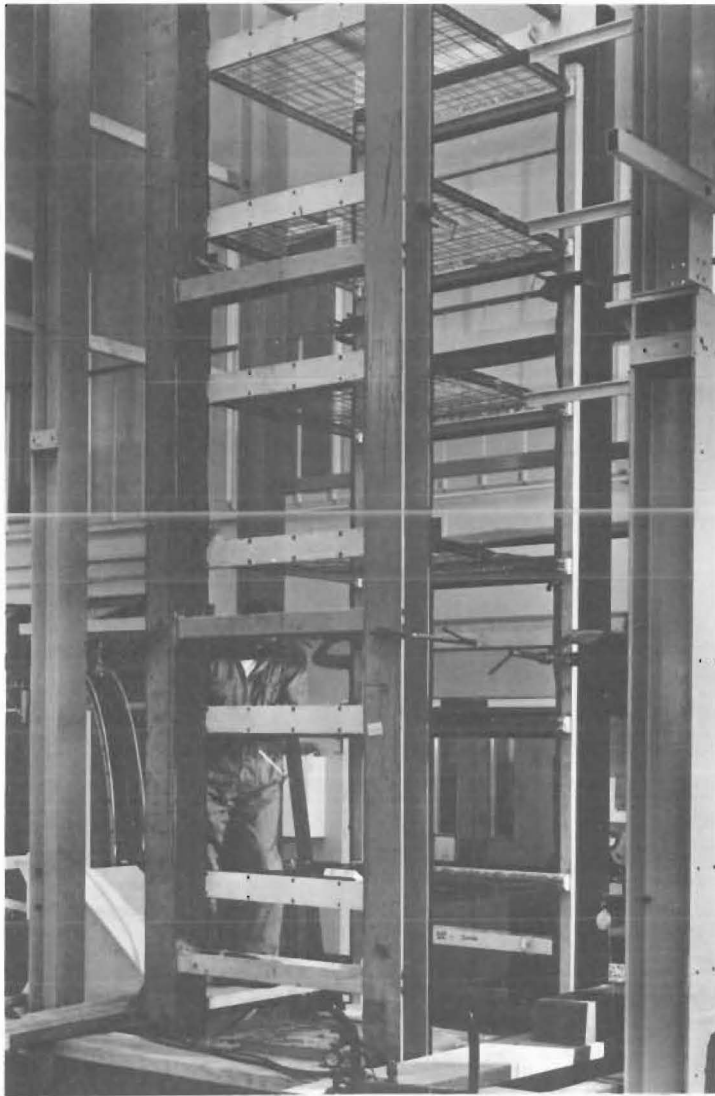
BUTT WELDING OF THE LATERAL BEAM REINFORCING
